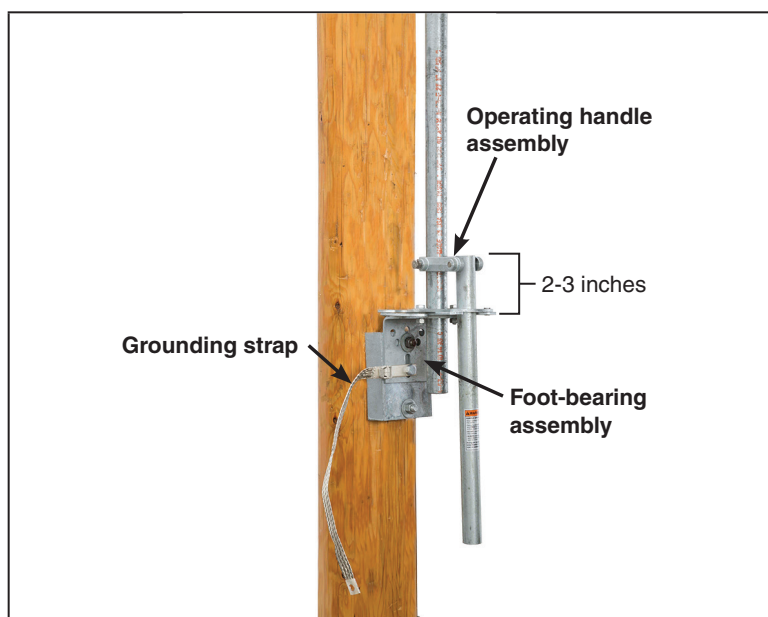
Install the foot-bearing assembly so the operating handle assembly is 2 to 3 inches above the foot-bearing assembly.
